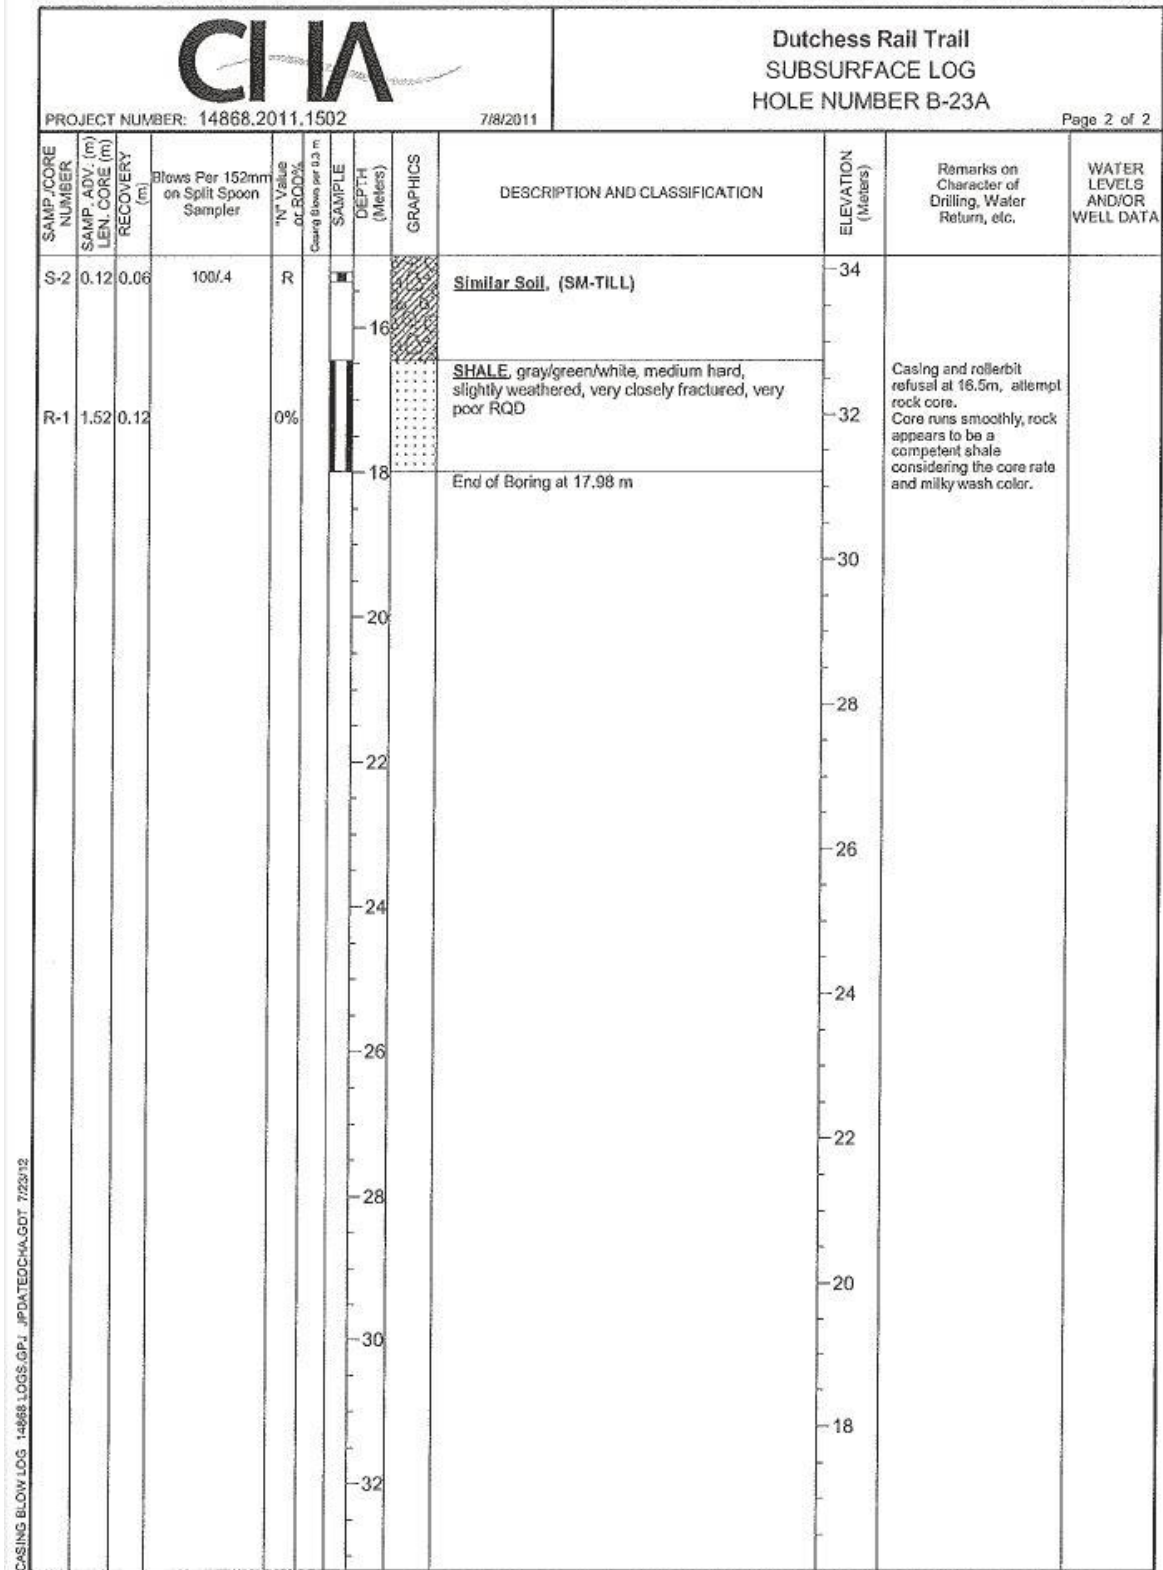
Subsurface logs at proposed end abutment showing shale bedrock
